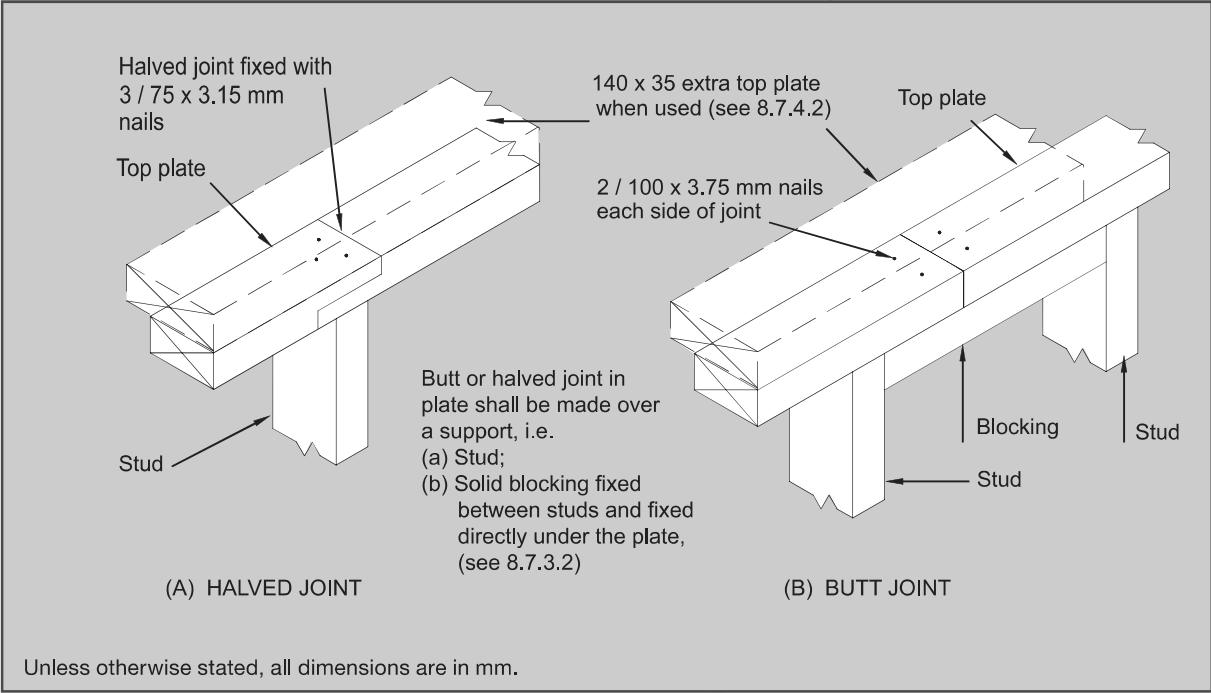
Connecting top plates – Walls not containing bracing (see 8.7.3.2)
